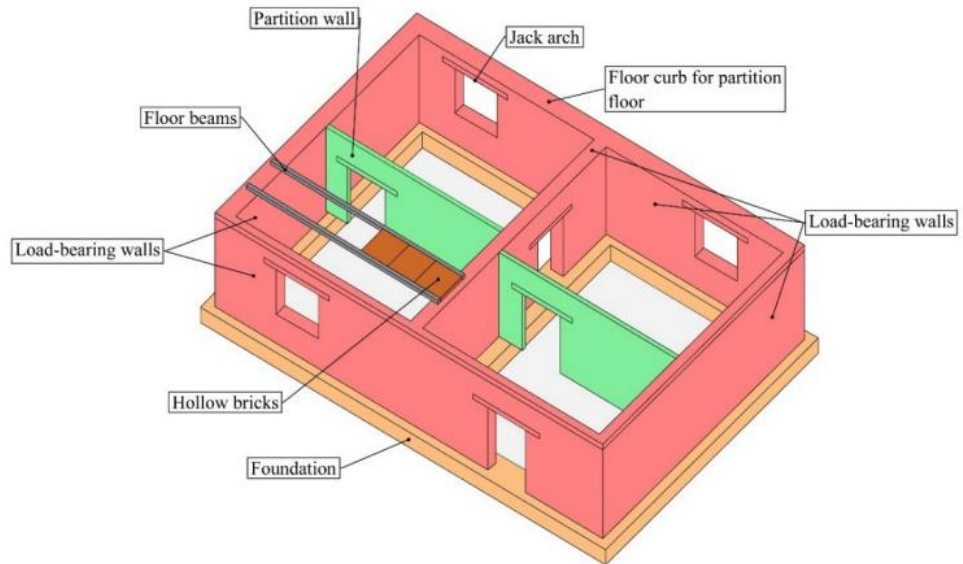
Load-bearing walls building scheme (drawing by G.B) [13].
